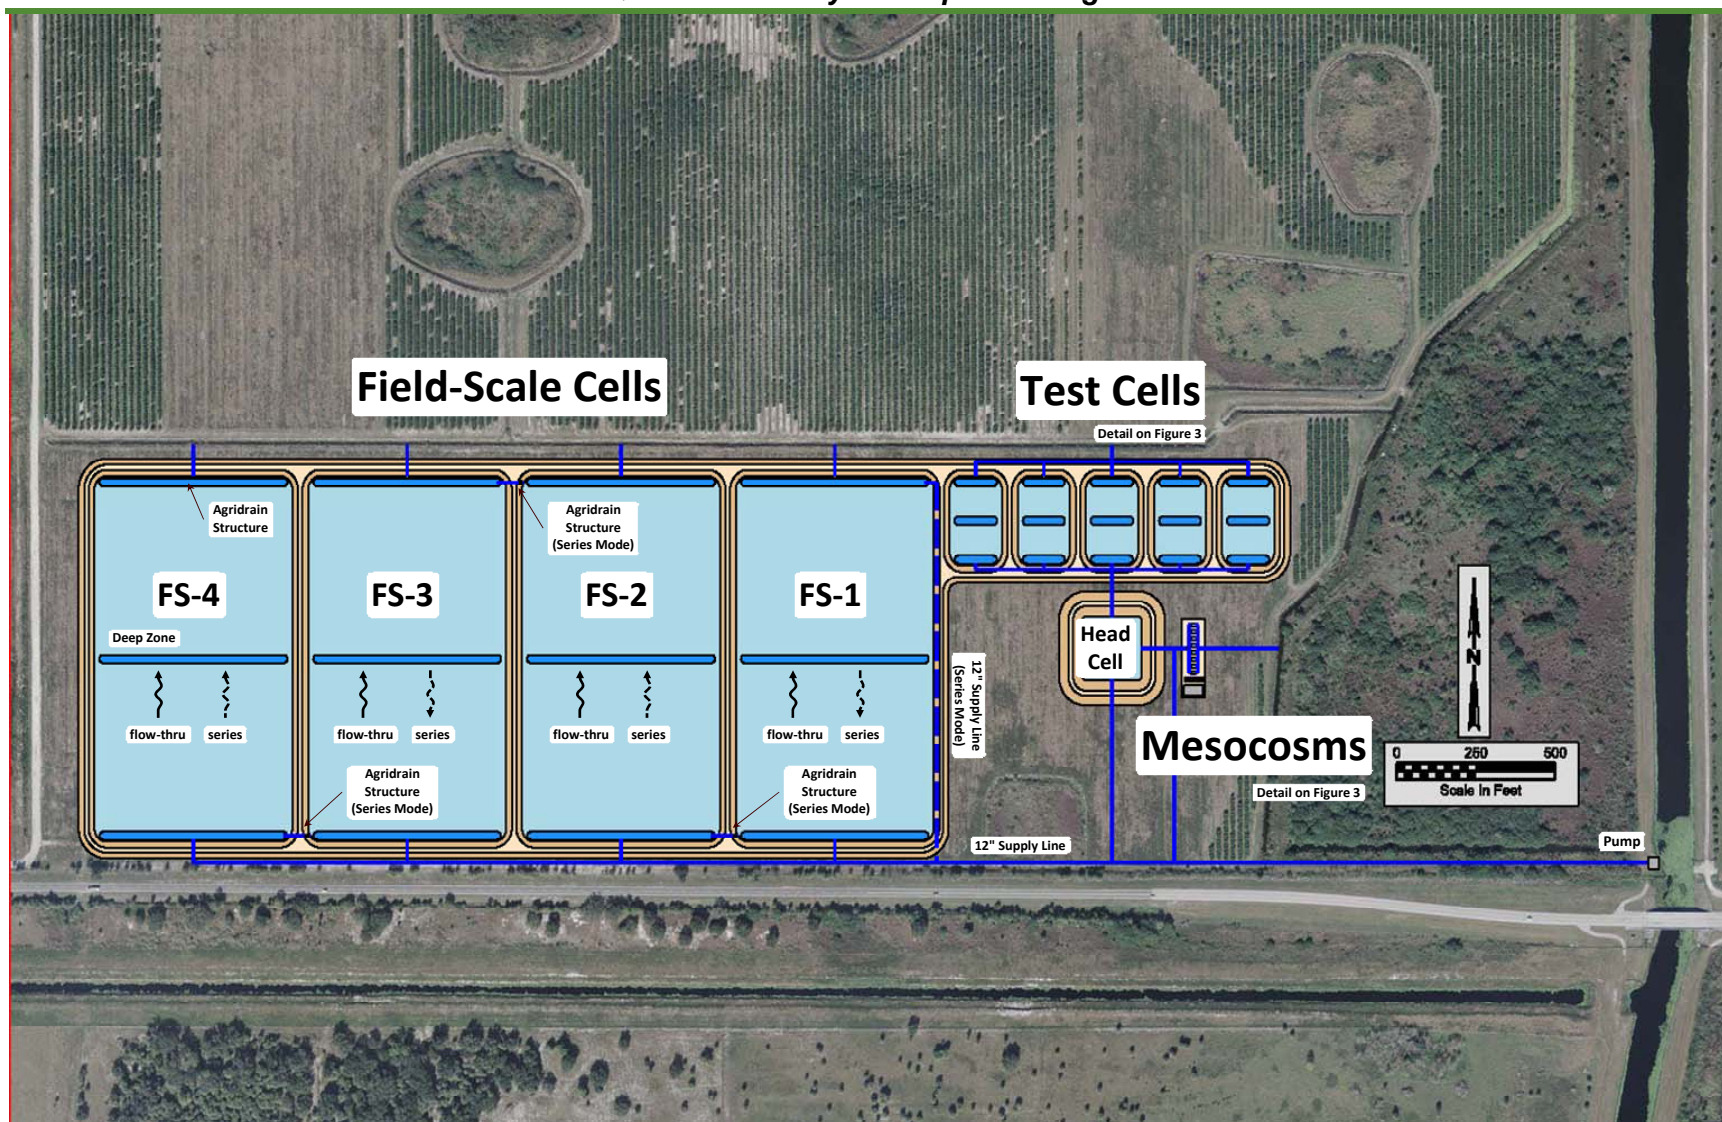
Proposed C-43 WQTA Test Facility Site plan
